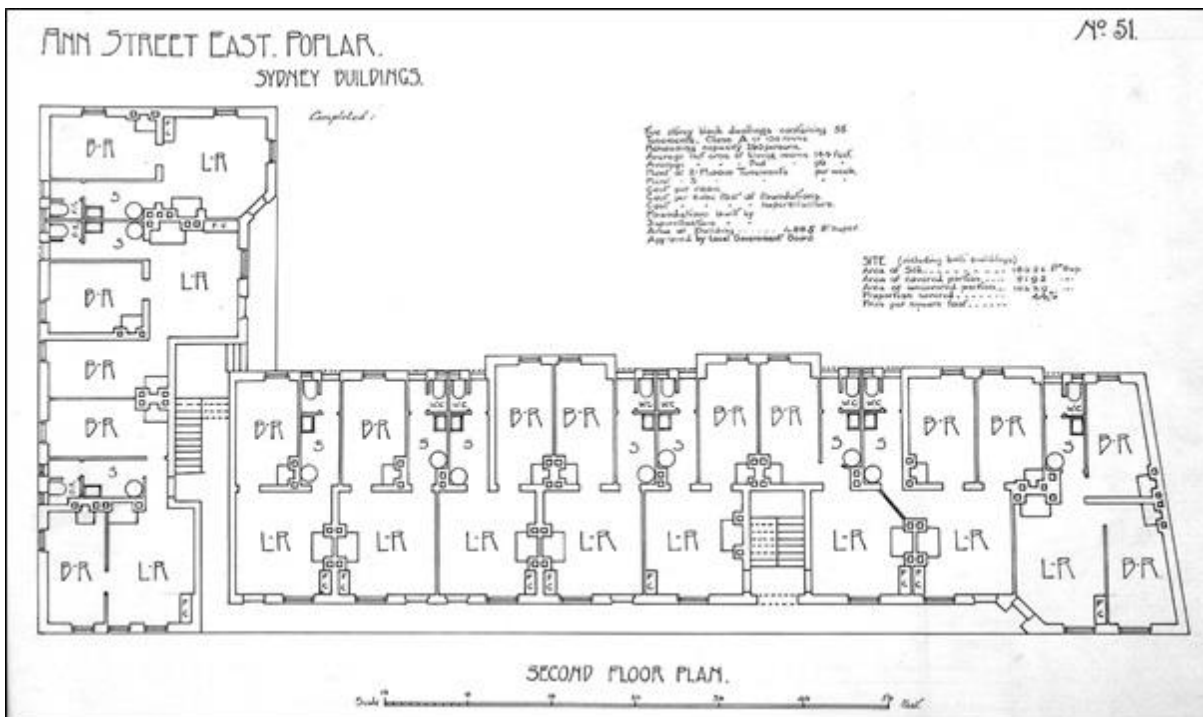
Sydney Buildings floor plan (LMA ref: LCC/AR/HS/03/059)
